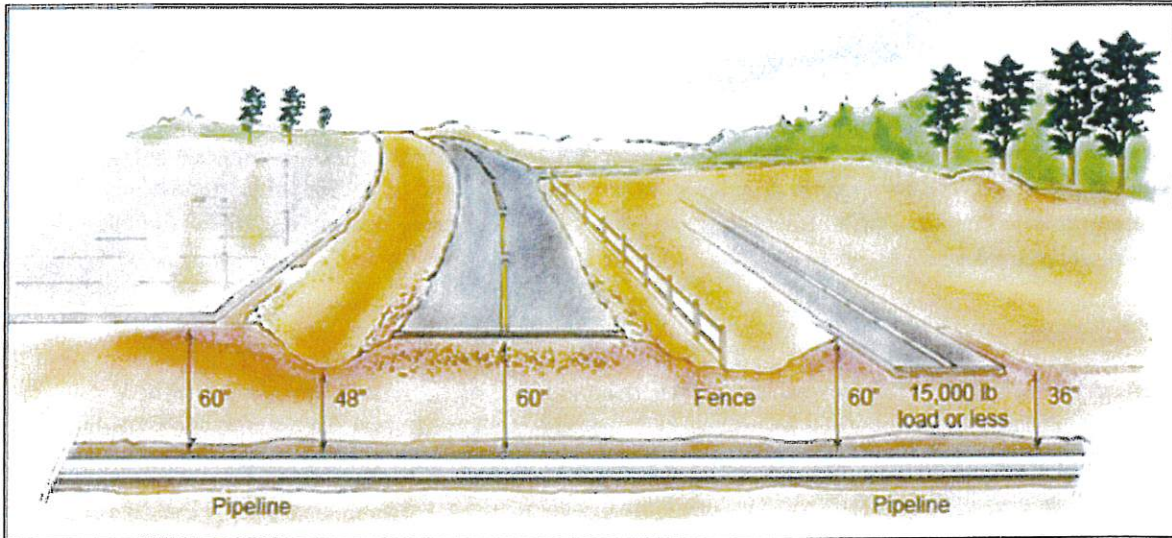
ALL ROADS, PARKING LOTS, DRIVEWAYS, AND HEAVY EQUIPMENT CROSSINGS MUST BE APPROVED PRIOR TO INSTALLATION. SEE SAMPLE BELOW.
